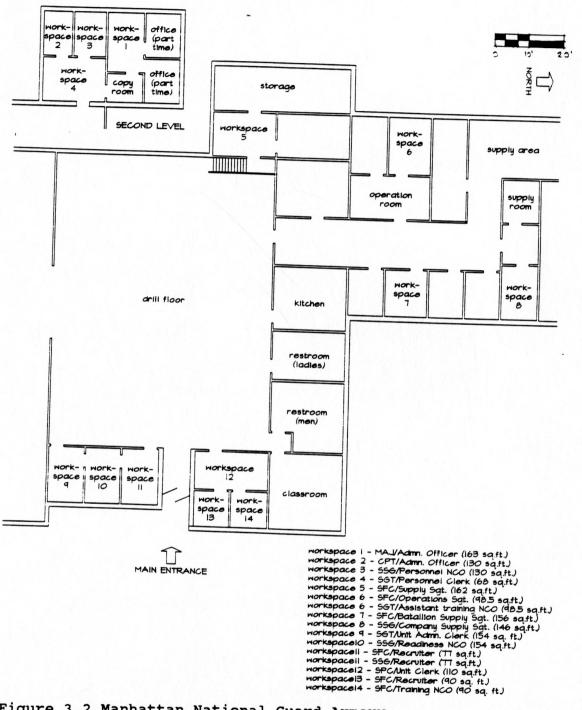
Manhattan National Guard Armory. Floor plan.
